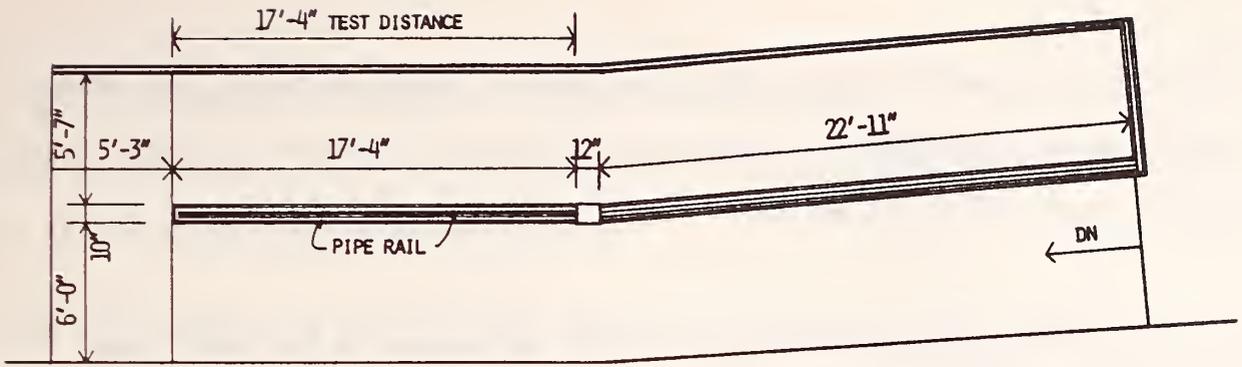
UPPER LEVEL RAMP PLAN AND SECTION
